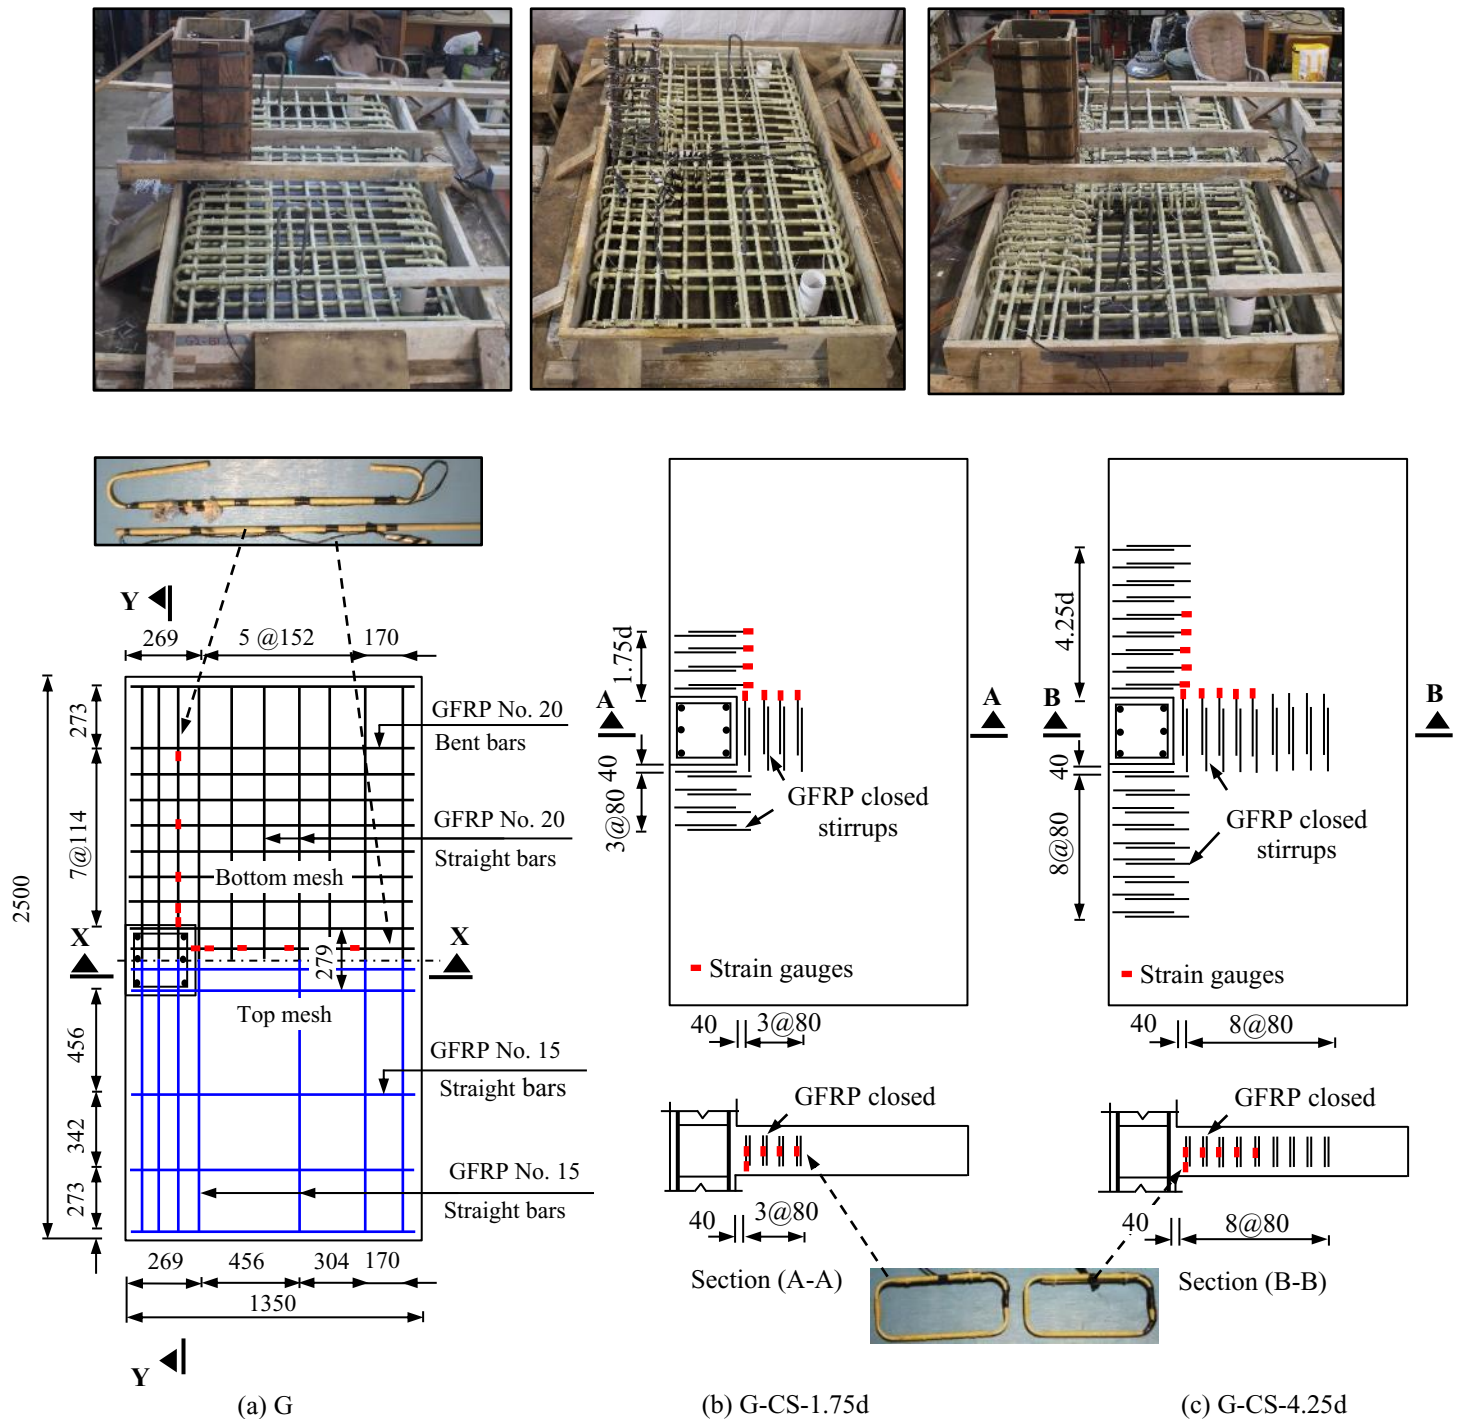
Typical reinforcement details and stirrup layout for slabs with and without shear reinforcement
